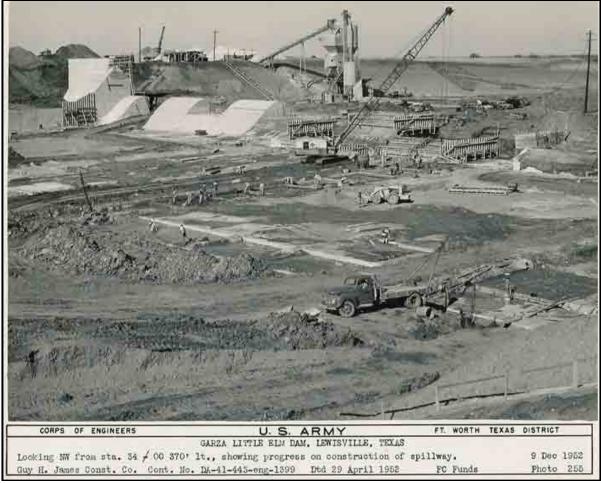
Construction of Lewisville Dam Spillway, 9 Dec 1952
